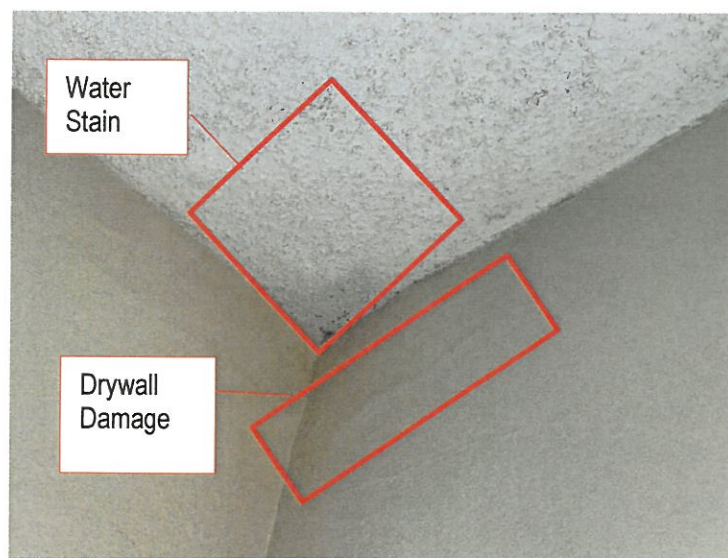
Visualization of Water Stain and Drywall Damage, Unit 303-08
